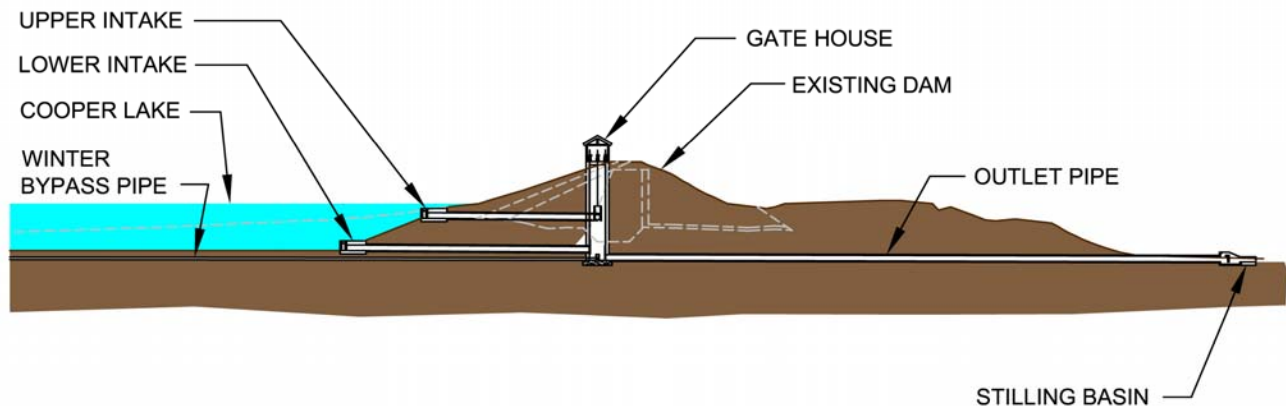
Section of Gravity Outlet Structure with Two Pipes
